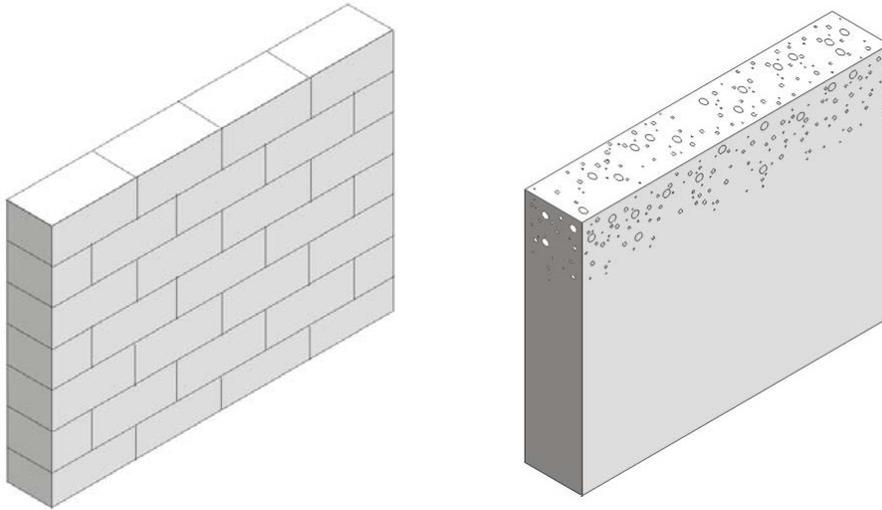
Solid Unit Masonry (left) and Solid Concrete (right) Walls
